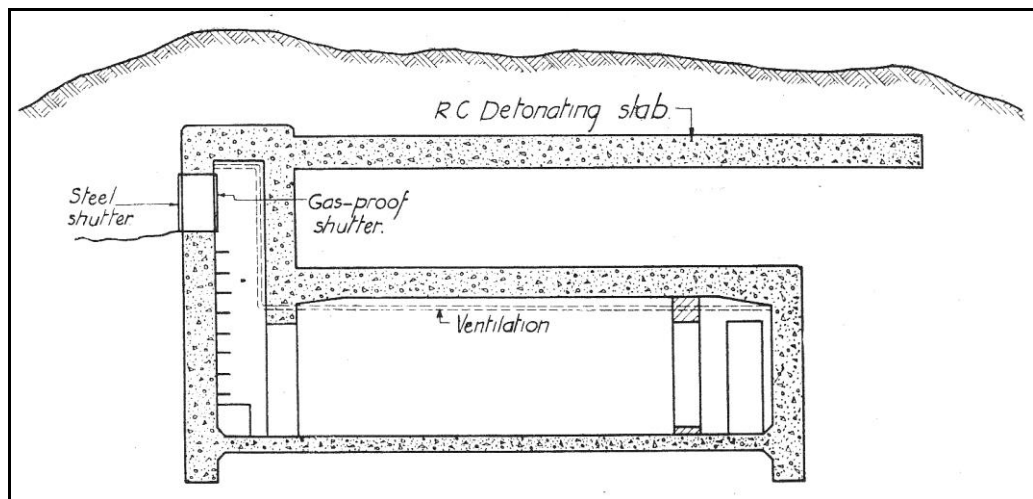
Section view of bomb proof shelter with detonating slab above (CCA n.d.c: 16)
